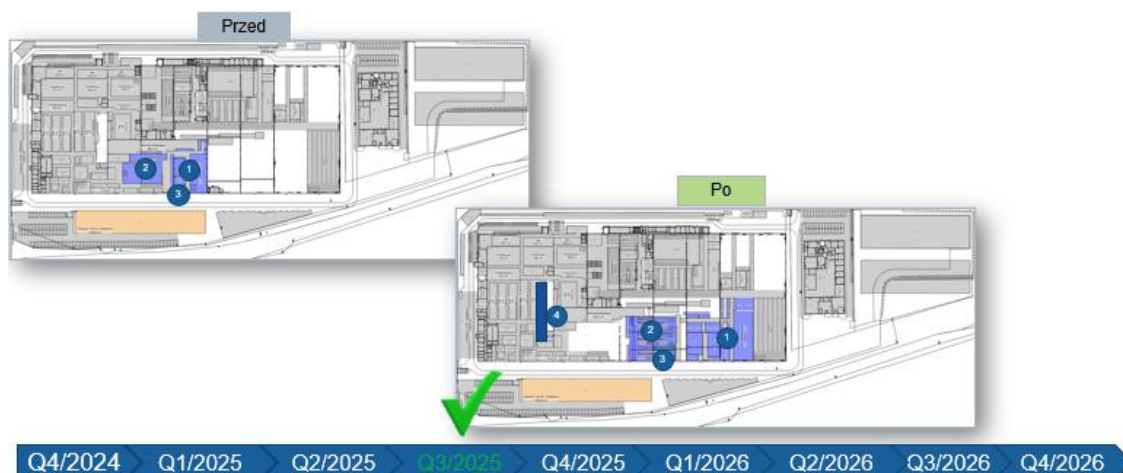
Reconstruction Plan – Stage V: 1-Transfer of the sheet metal processing area and steel warehouse; 2-Transfer of spiral production machines and pipe warehouse; 3-Transfer of the steel disc cutting machine; 4-Construction of a new welding line 4.1 (LS4.1).
